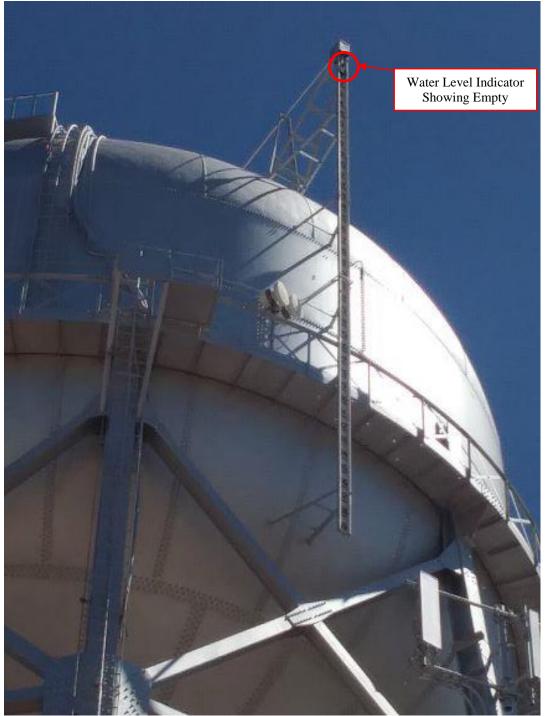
Water tower gauge reading empty (note level indicator at top), September 6, 2018, view East
